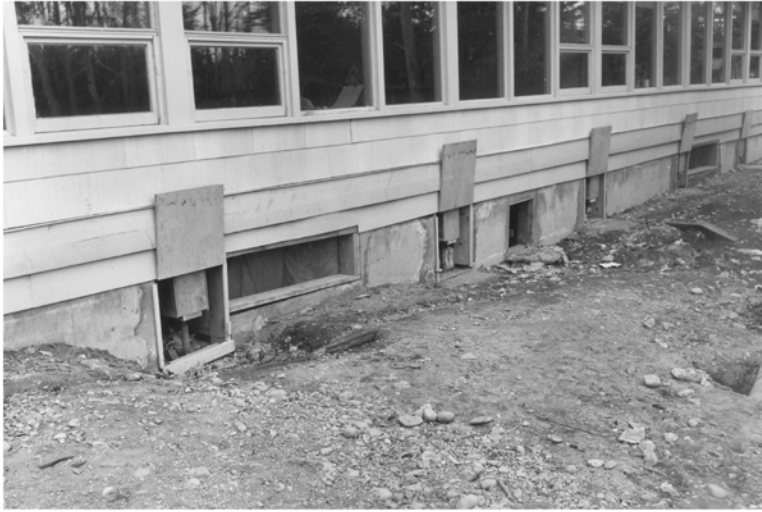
Schoolhouse at Glennallen built in 1952-1953 on Ice-rich permafrost. Air vents, which are open to allow cold air to enter the crawlway in winter to counteract heat from building. The vents are closed during the summer. Jacks are used to counteract differential settlement. The system was only partially successful and the school was demolished in the 1960s. Photograph 95 by T.L. Pew, May 4, 1954.
